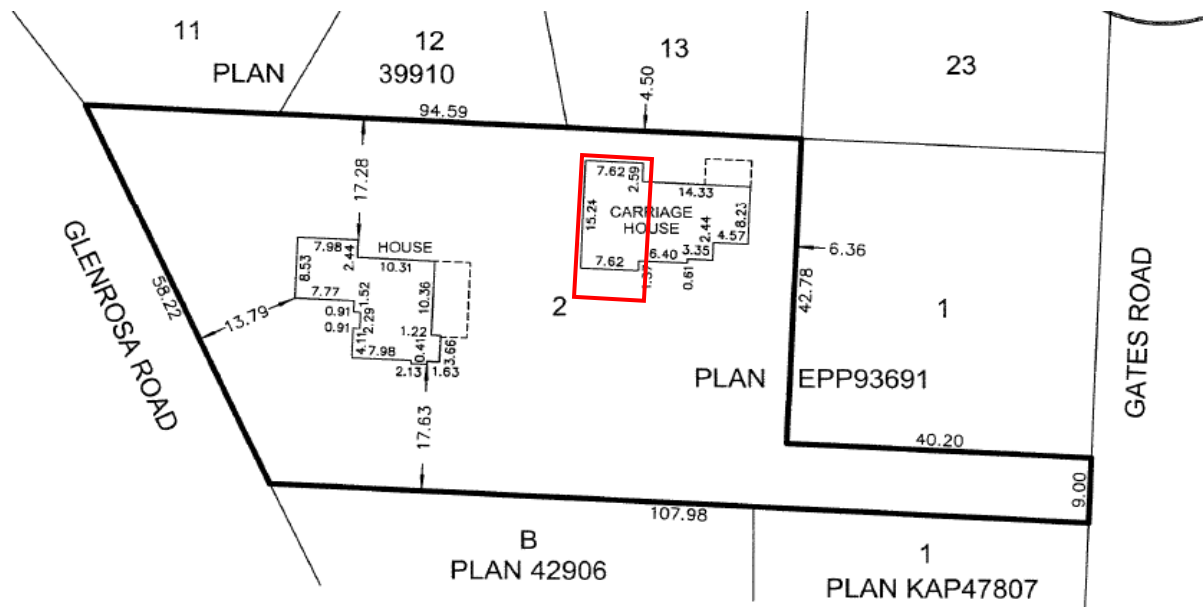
Site Plan with proposed accessory building highlighted (attached to carriage house).
